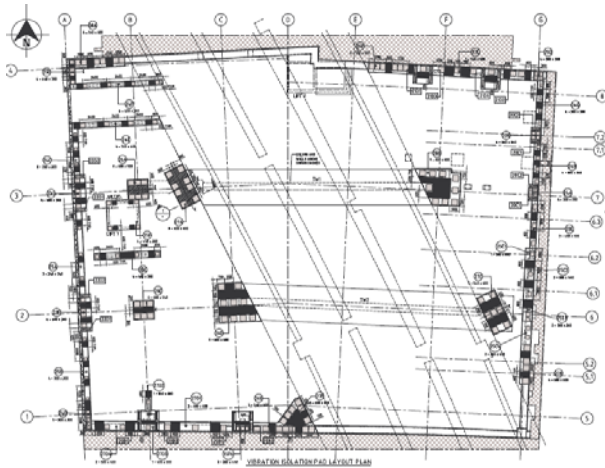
Vibration isolation layout at building footing level. A significant number of vertical bearings were used under the transfer walls across the tunnel easement. The rest of the bearing was distributed along the load bearing walls, columns and elevator shafts.
